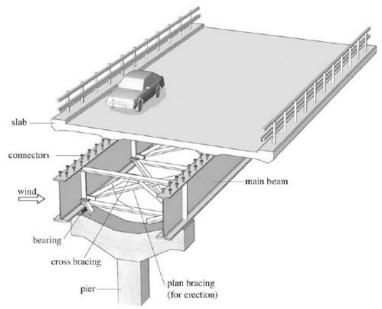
Schematic view of the structural elements of a composite twin girder bridge (Lebet & Hirt, 2013)
